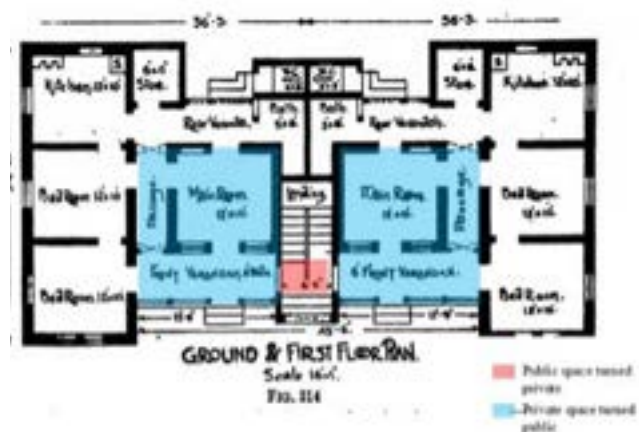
Perceived private and public spaces on a generic floor plan of a flat. R. S. Deshpande's Residential Building suited to India, 243.
